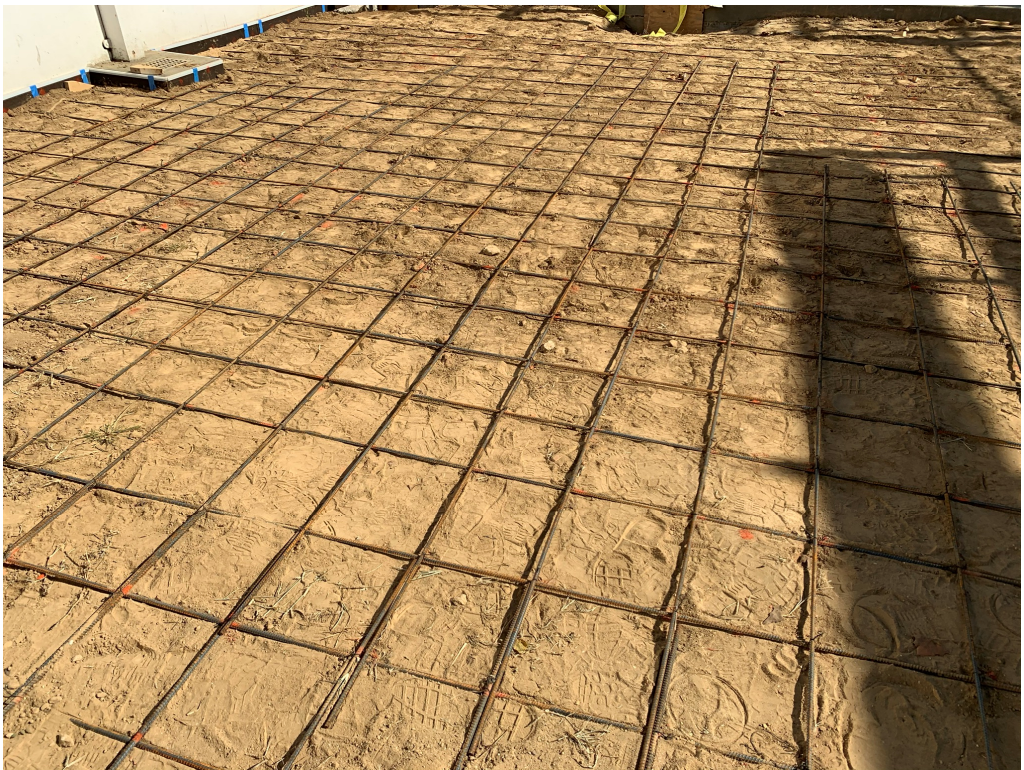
Rebar Made up (lift rebar on chairs before pour)
